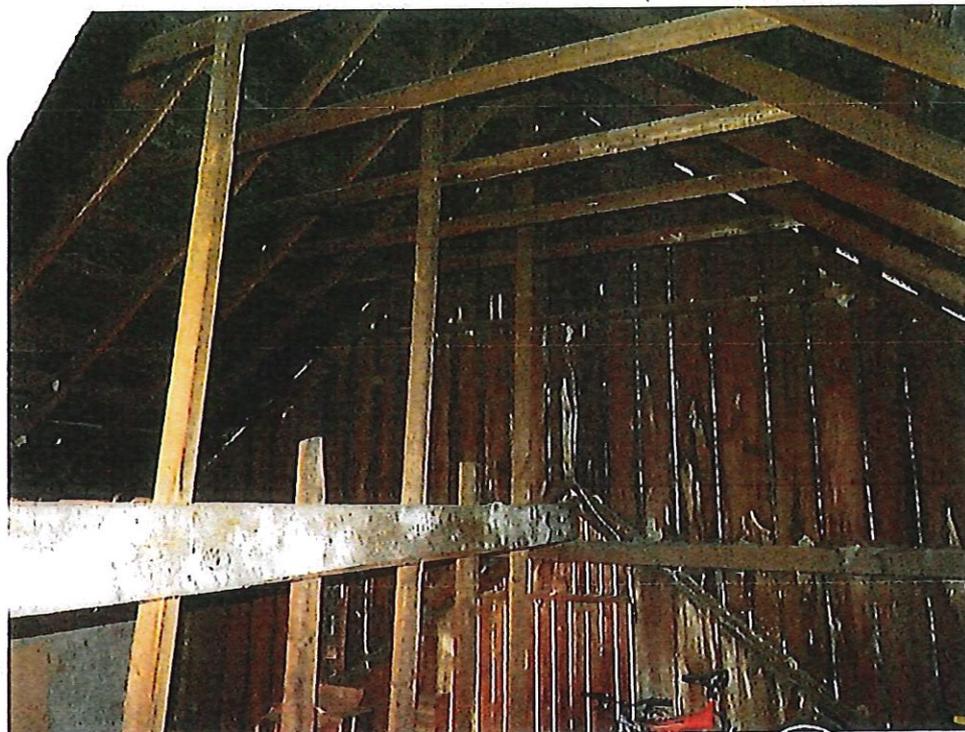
Roof framing showing rafters, collar ties, and additional framing elements
